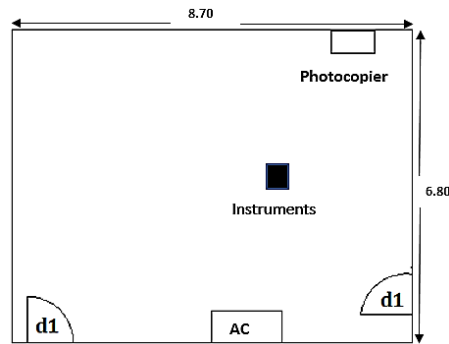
Plan view of the test chamber used for the experiment on synthetic building materials (Location_03- All the dimensions are in meters)
